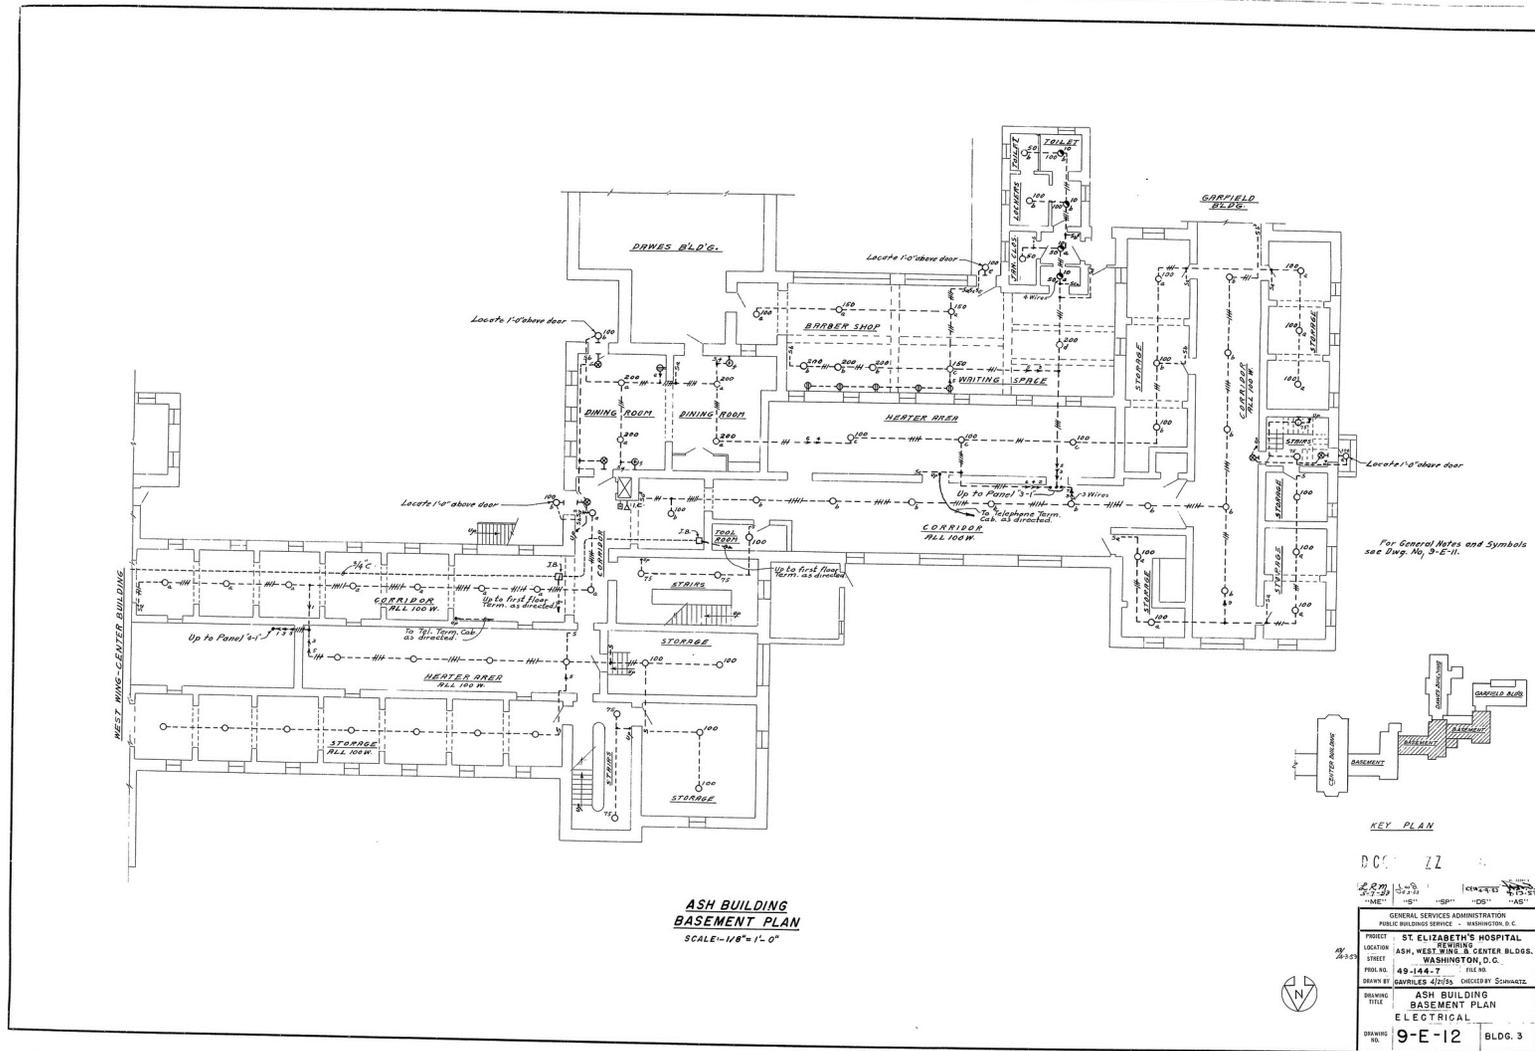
Basement plan of West Wing, outlining improvement to the electrical system, 1953. Source: GSA archives, image DC0070SE0004.
